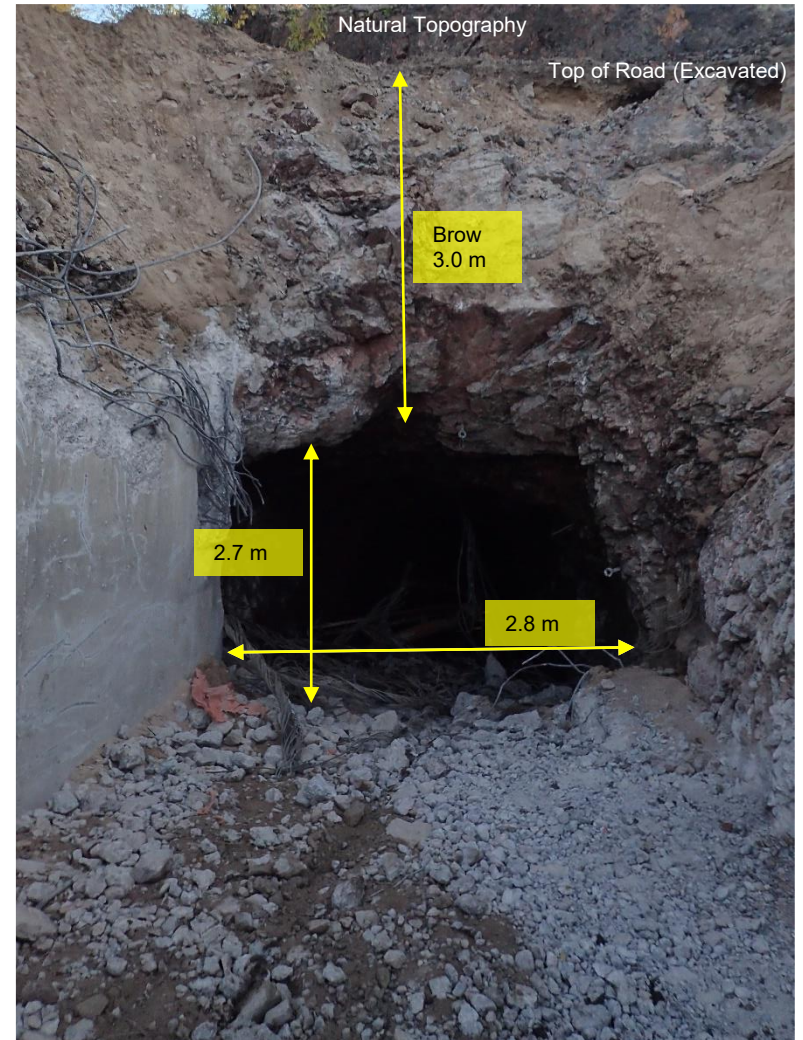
Overview of the CB-1 Mine Opening and Dimensions. Cables and conveyer belt visible within the opening.
